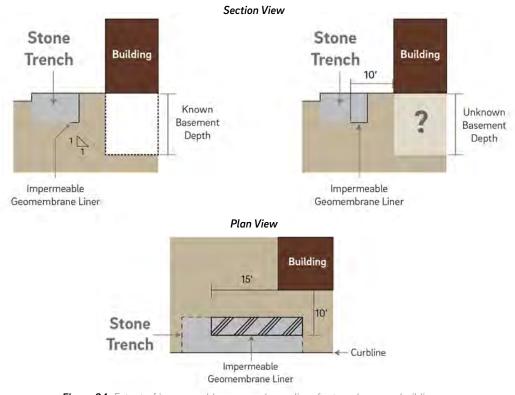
Extent of impermeable geomembrane liner for trenches near buildings.
